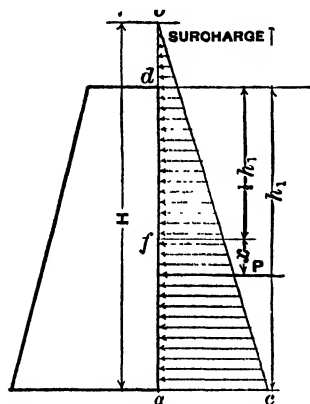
Earth Pressure on Vertical Back of Wall with Surcharge. (See p. 666.)
